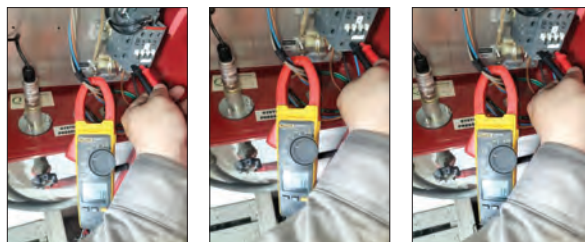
Check the resistance of the jockey pump electric motor winding.
